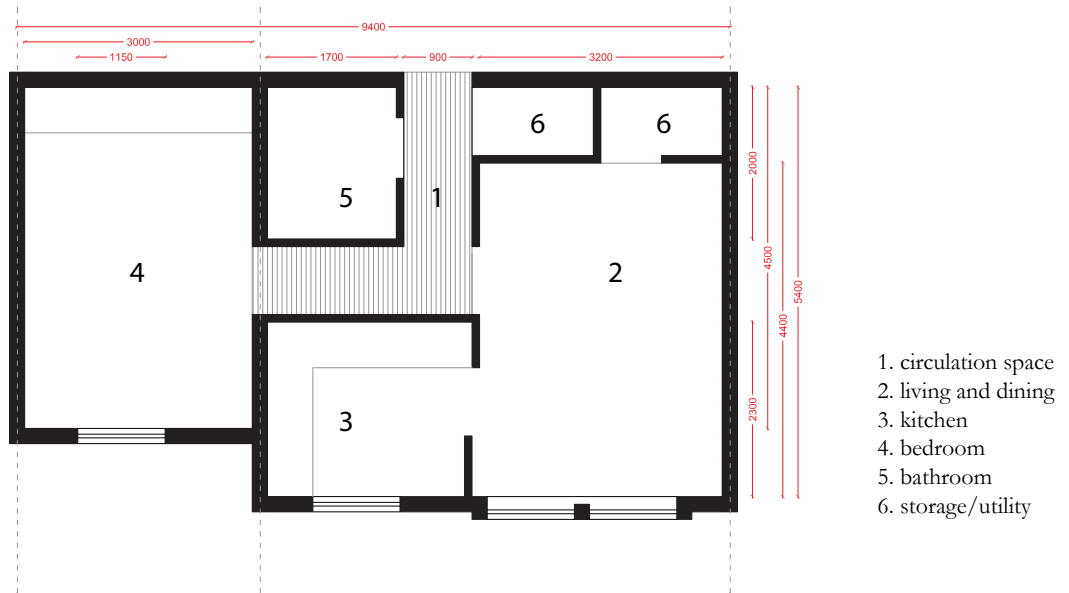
Current floor plan (scale 1:50) and organization scheme of the 1b2p-flat
